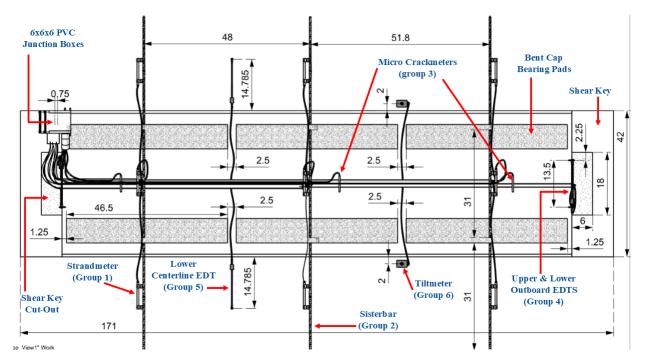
, Drawing, Bent Cap Top View (Slabs, Beams, and Parapets not Shown)
